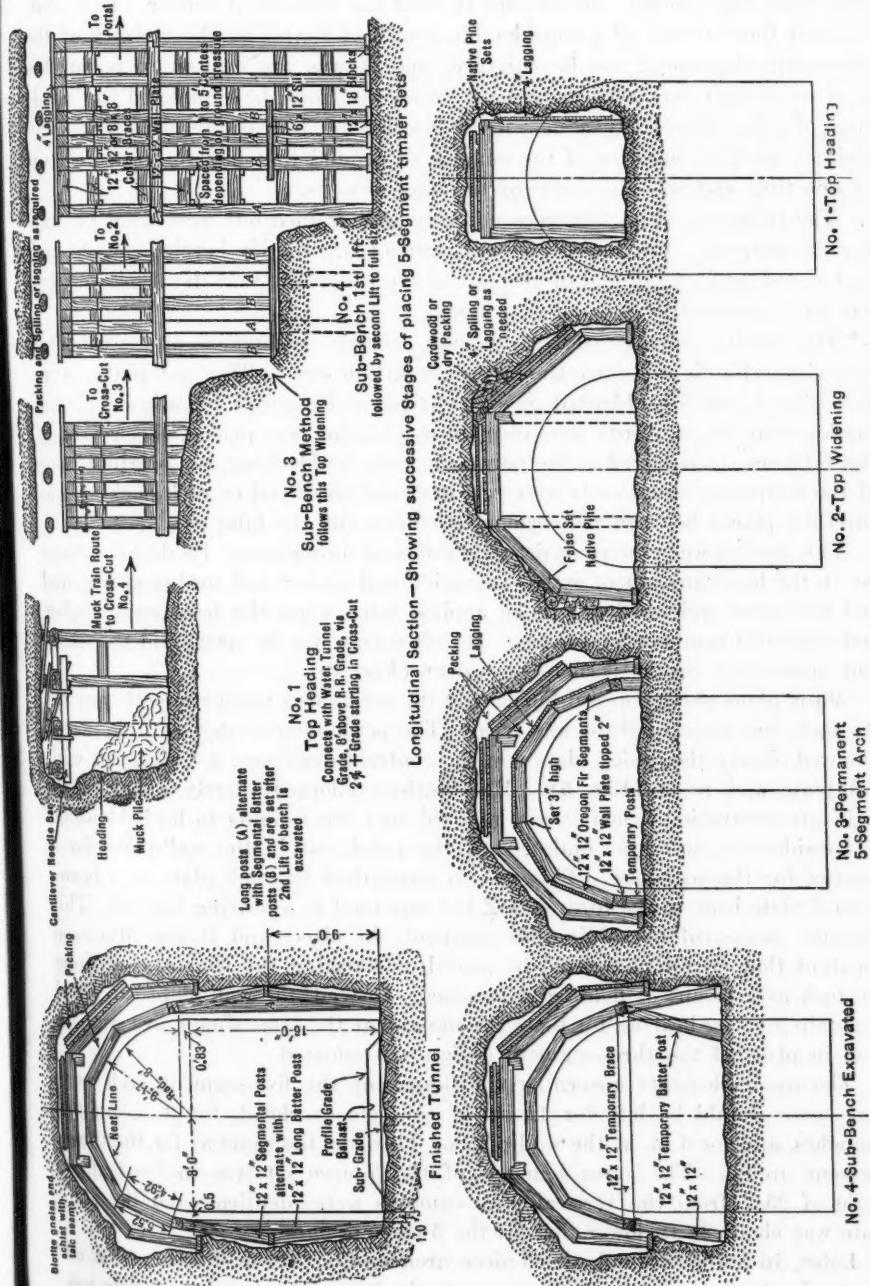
TIMBERING METHOD, WEST PORTAL, MOFFAT TUNNEL.
